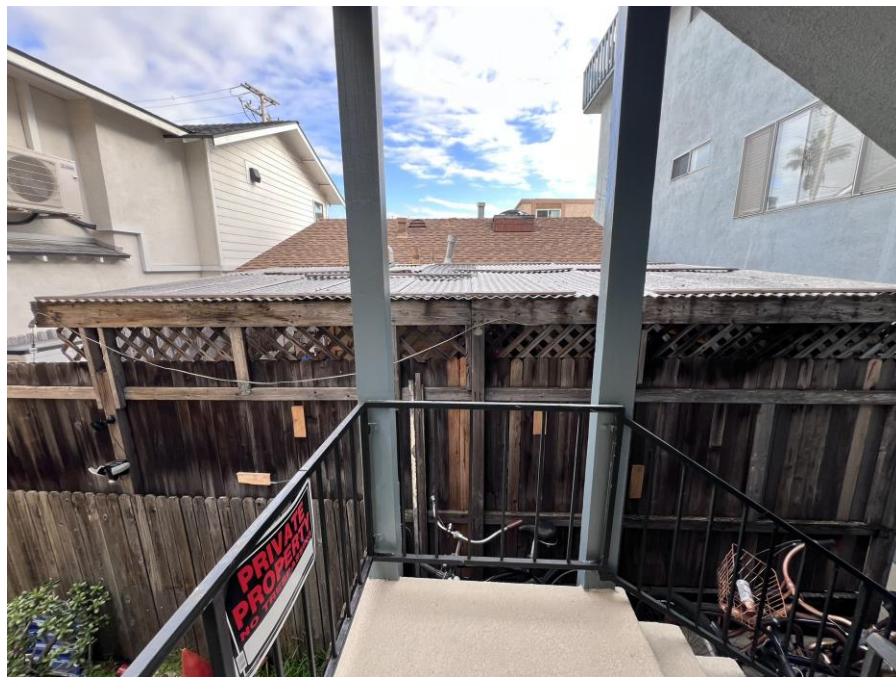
Wood fence and covered patio at north elevation, view south.
